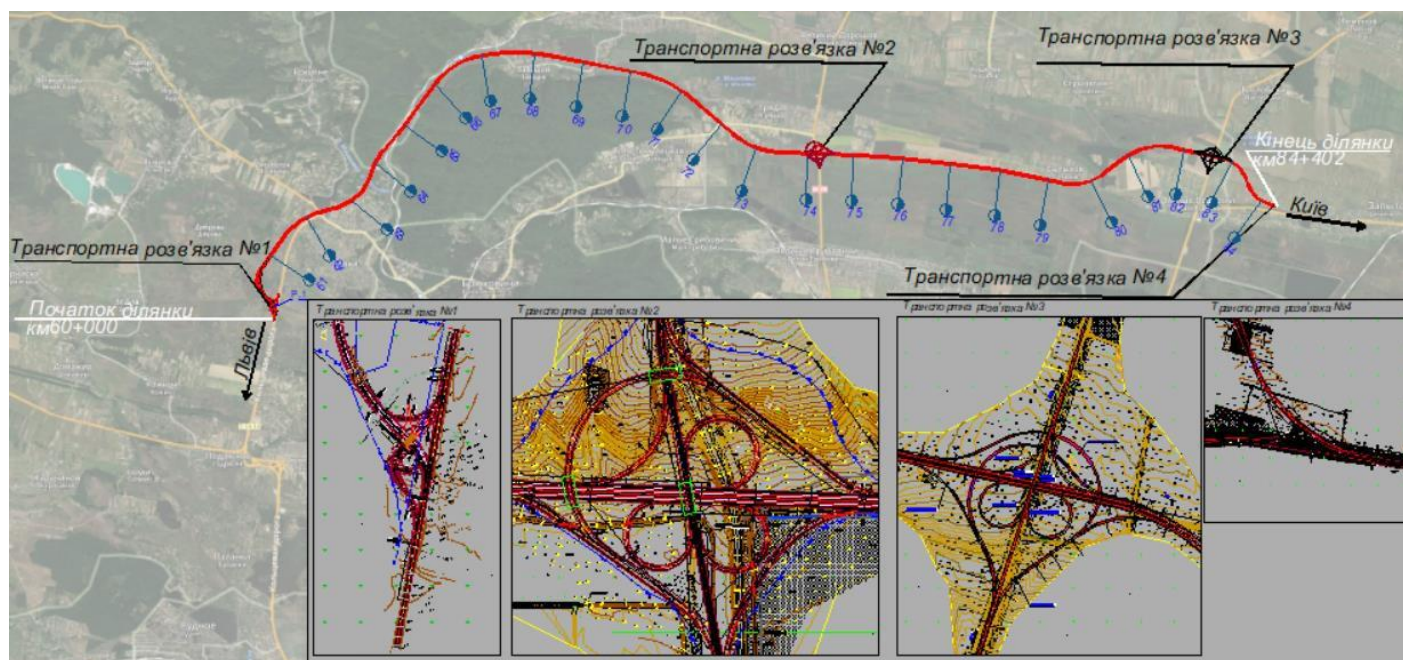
Construction of North Section of Lviv Bypass Road. Layout plan of traffic interchanges included in the design
